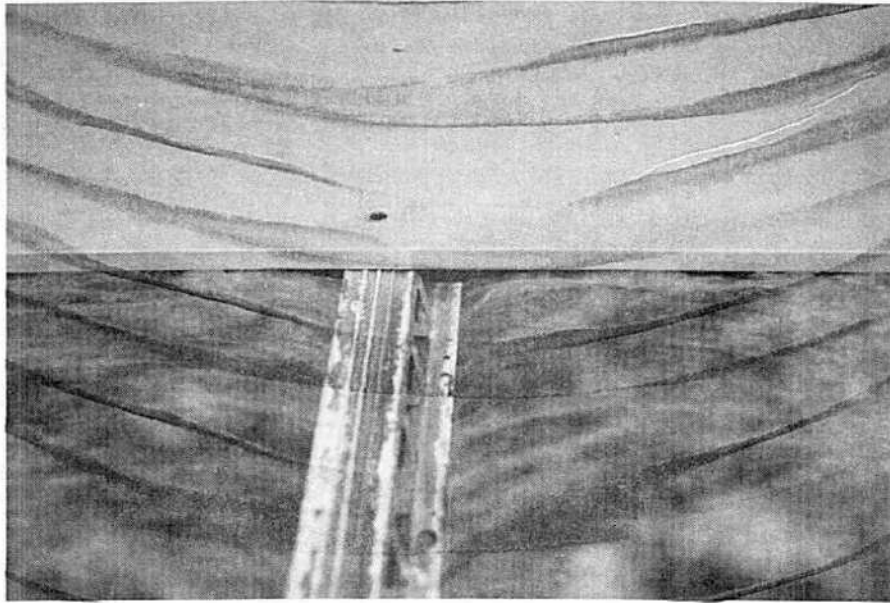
Wall E showing mounting of gypsum board over resilient furring strips and glass fibre blanket.
